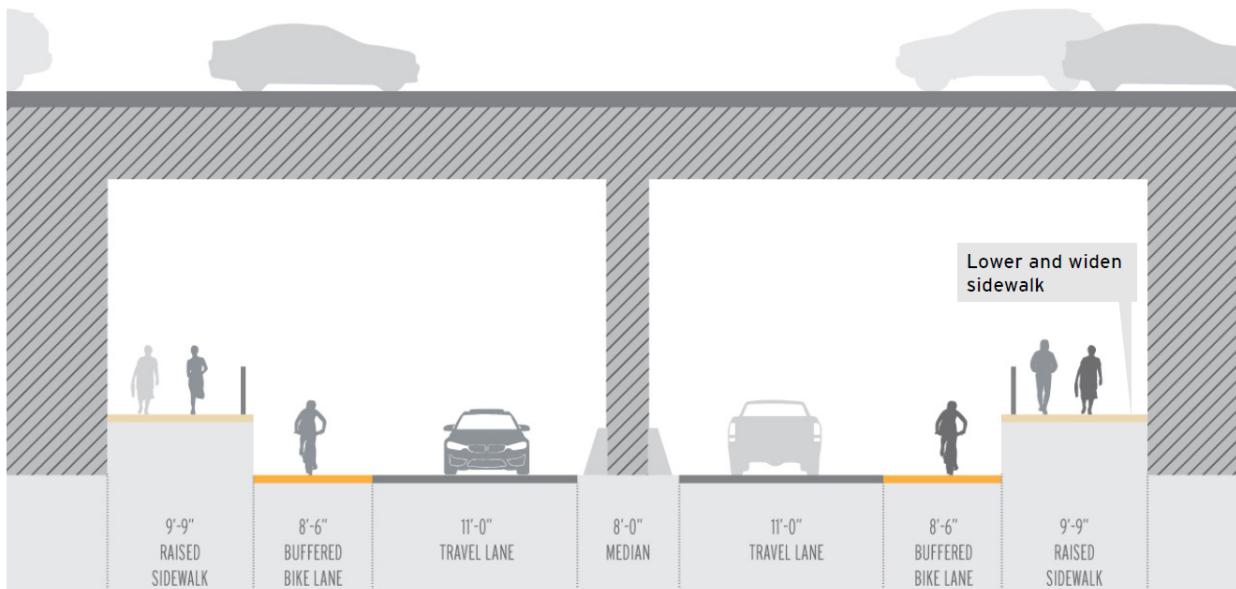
Greenwood Avenue Concept 2: Cross Section C
